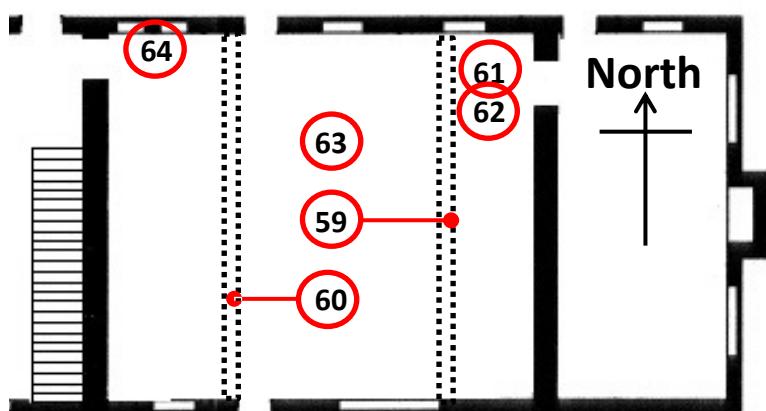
Simple plan of the ground-floor rooms to the easternmost bays of the barn to help locate sampled timbers
